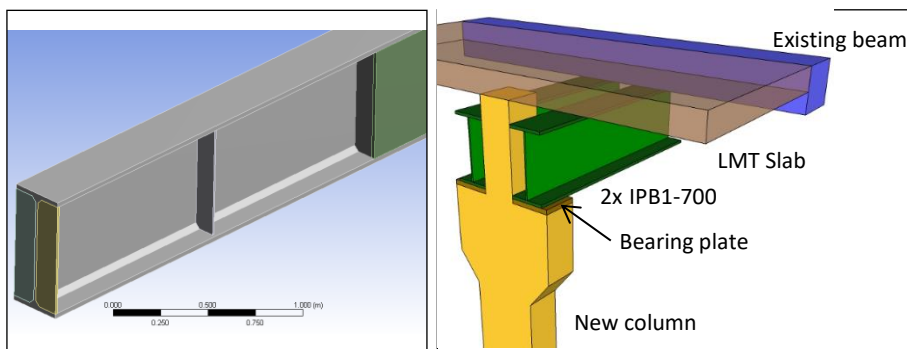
Steel beam with stiffeners and added plates, RC column with capital
